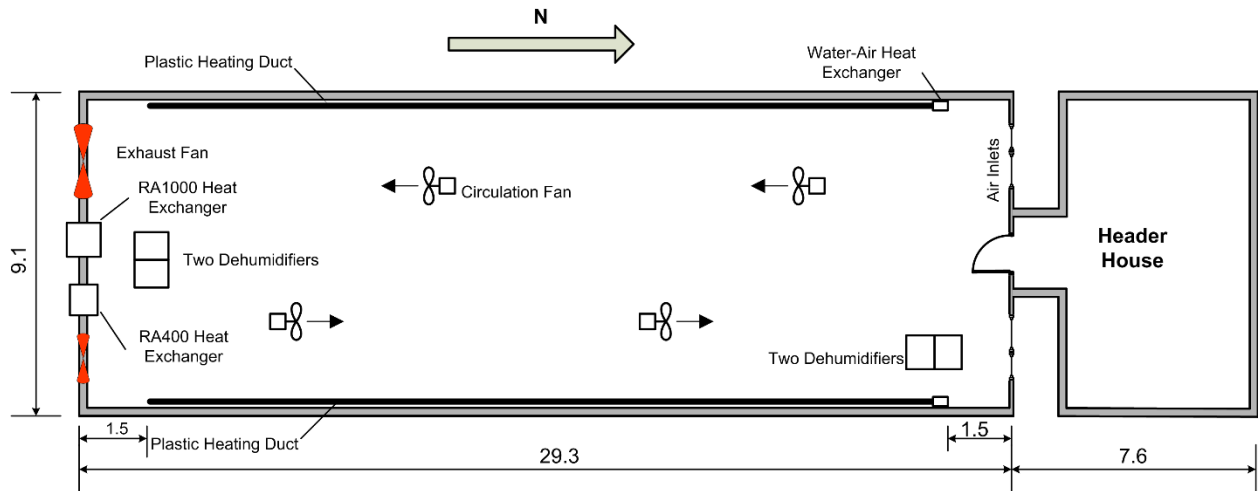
Sketch of the greenhouse layout (dimensions in m).
